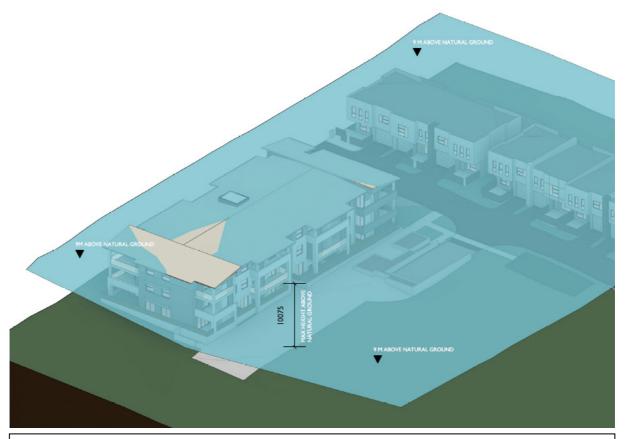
Extract from Height Plane Diagram indicating portions of the roof of the proposed residential flat building that exceeds 9m building height, shown in grey (ADM Architects Drawing No. A-405)
